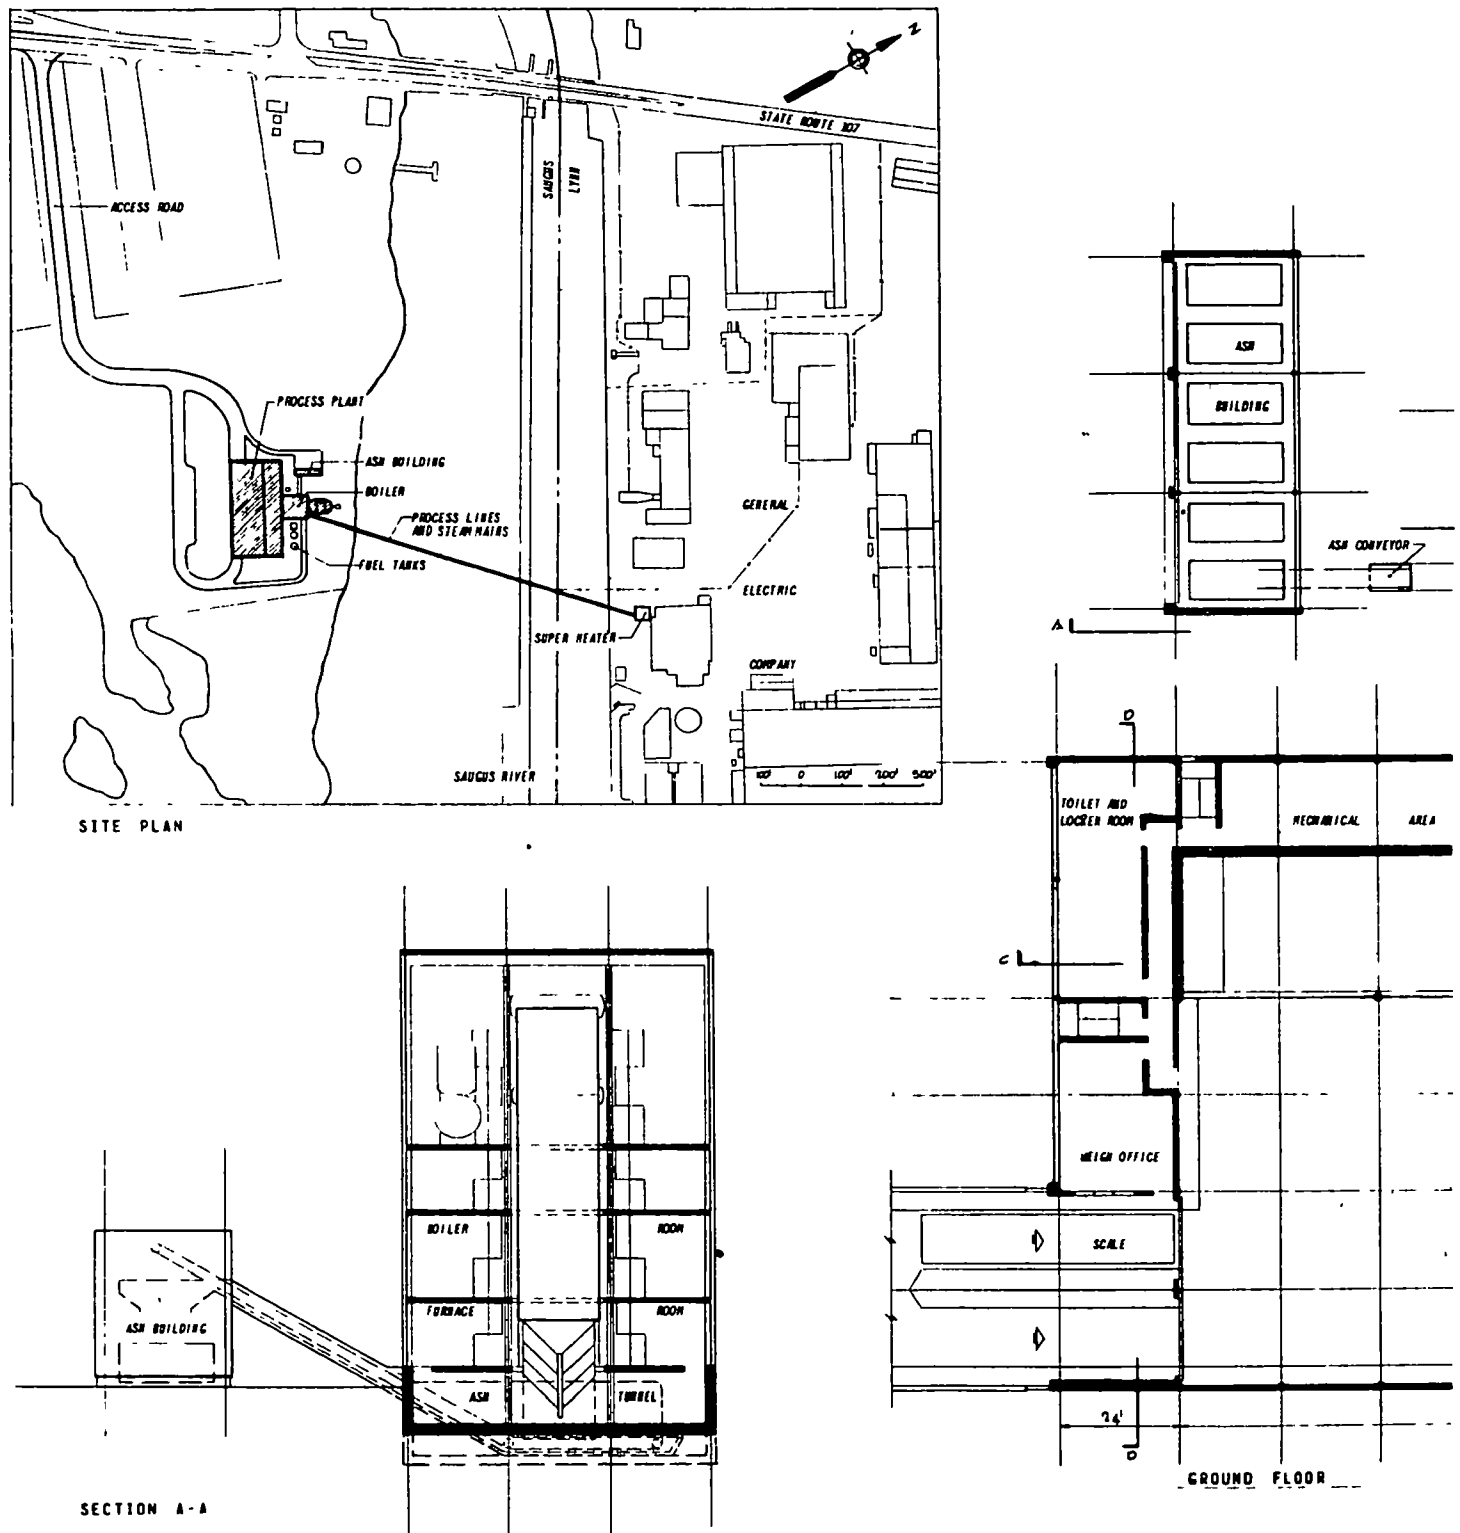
ALTERNATIVE B-1 - SITE PLAN, PLAN AND SECTIONS
